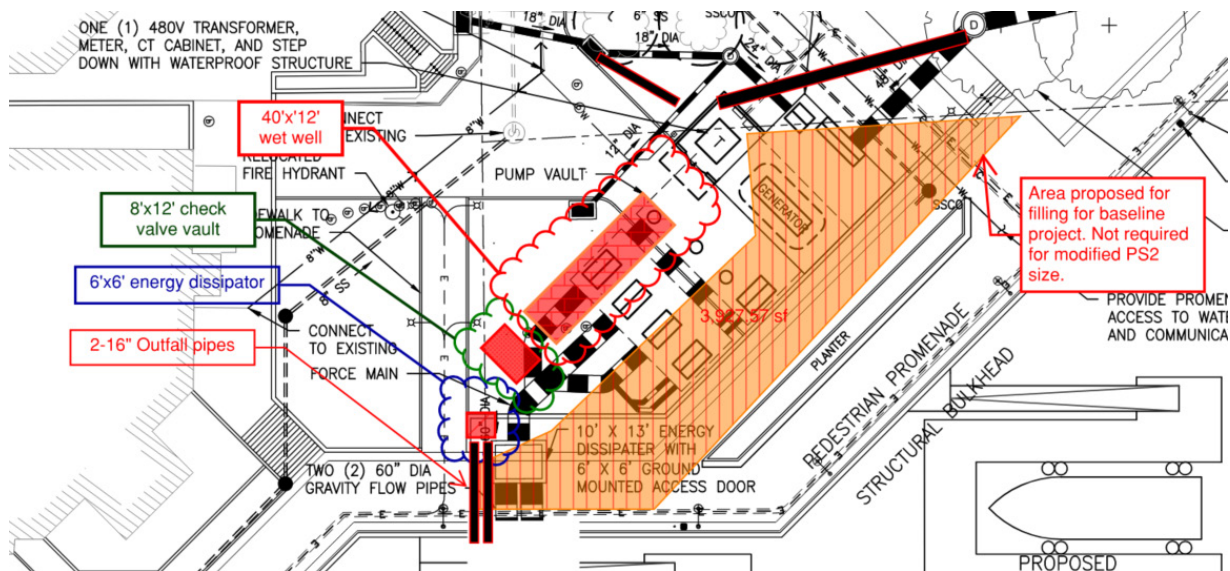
Northern Pump Station (PS2) Layout within Existing Shoreline
